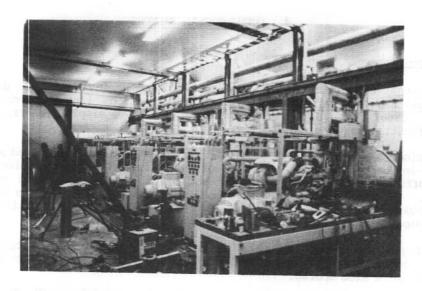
Inside the powerhouse (under construction) showing the four generator sets. The control room is out of the picture to the left. (Photograph by A.F. Dick)
